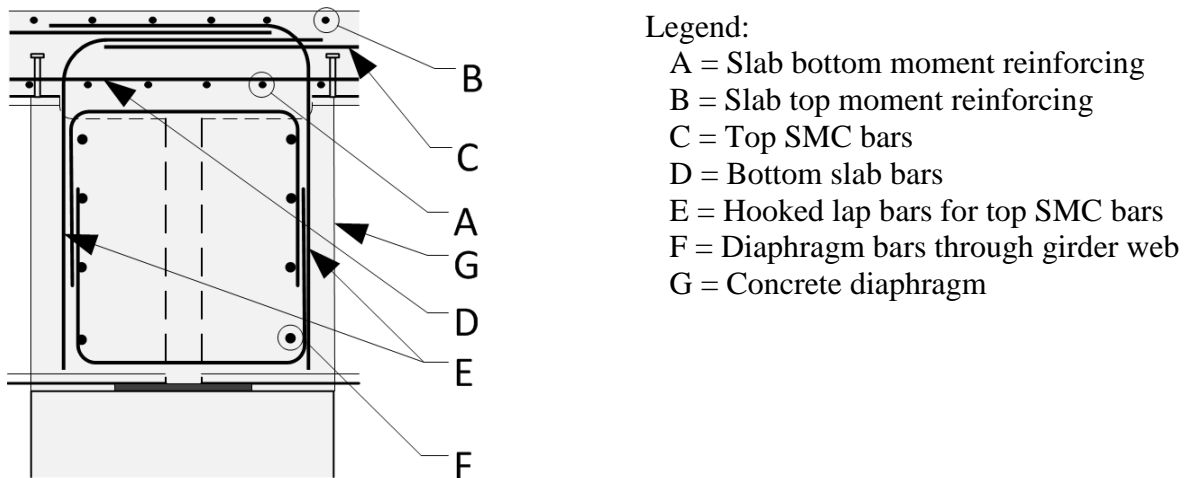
Detail at SMC Connection showing reinforcing layout in diaphragm and slab
